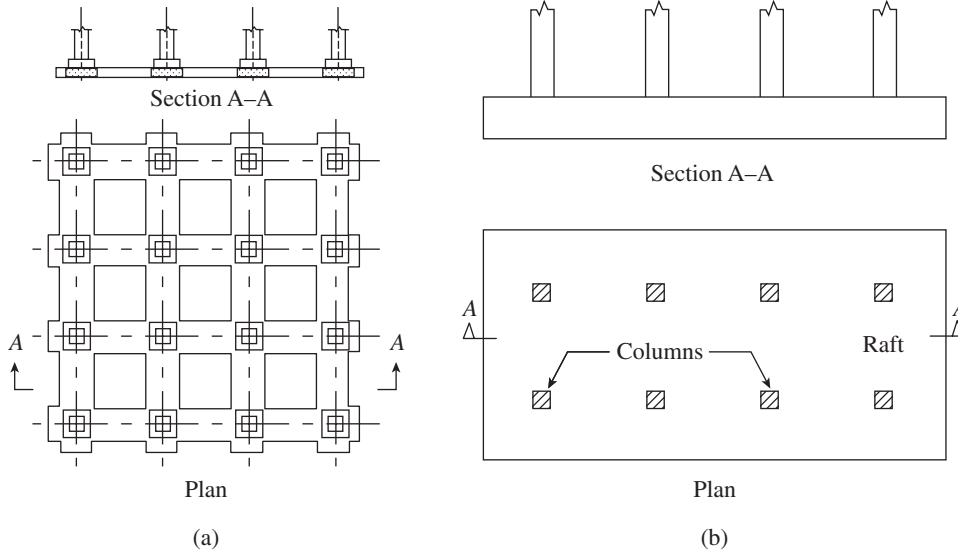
Arrangement of strips (a) Grid foundation (b) Mat foundation
